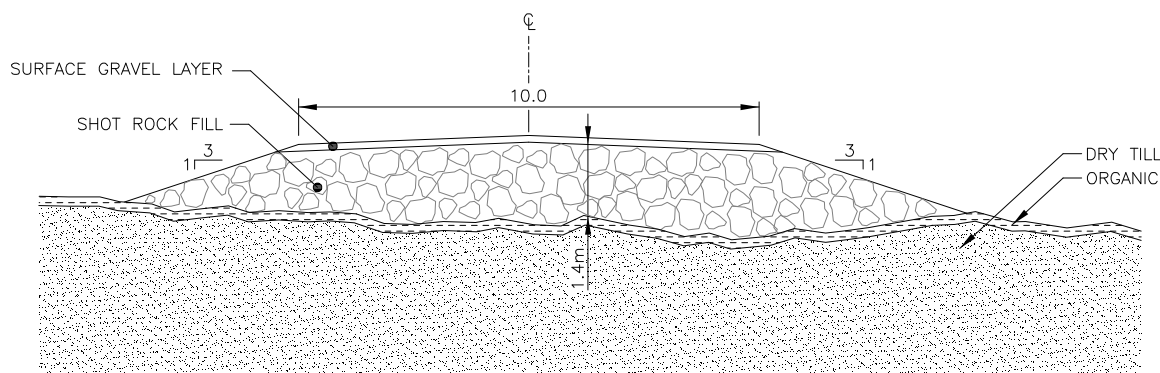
Typical Road Cross Section on Relatively Dry, Stable, Till (Terrain Type 1)
